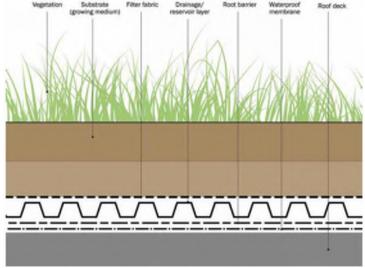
'SUDs Manual Figure 12.1 Section through a typical green roof'
